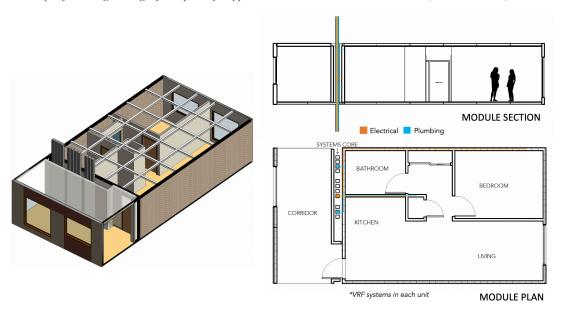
Left image: Axon of the corridor and residential modules with vertical systems. Right image: Plan and Section views showing systems connection into residential modules. (Source: Author)
